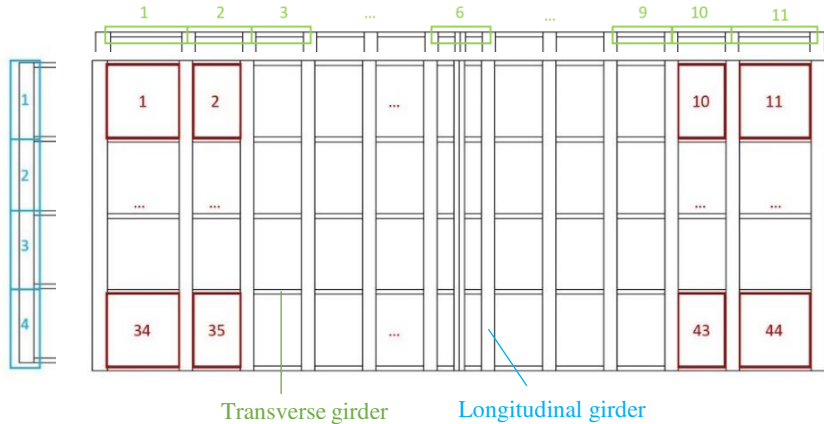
Subdivision in elements of the longitudinal girders, transvers stiffeners and slab
